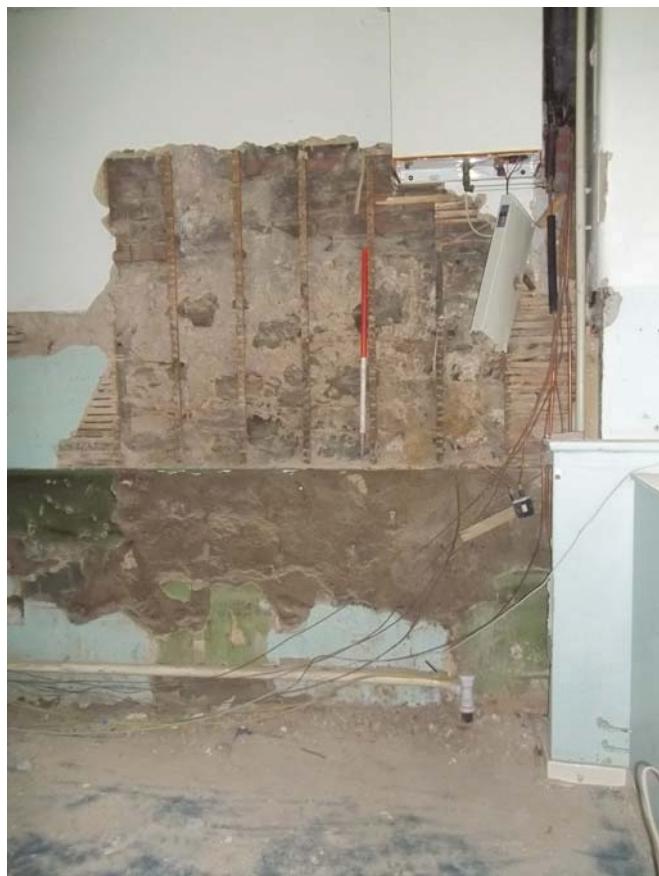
Cannonball House, lower ground floor, detail of exposed area to the south of the east wall from the west
